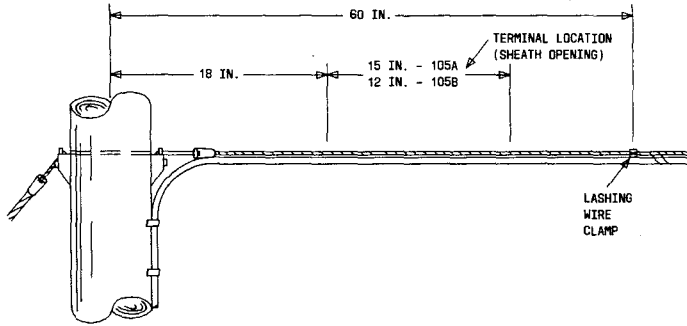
Terminal Location at Junction of Aerial and Underground Cable
